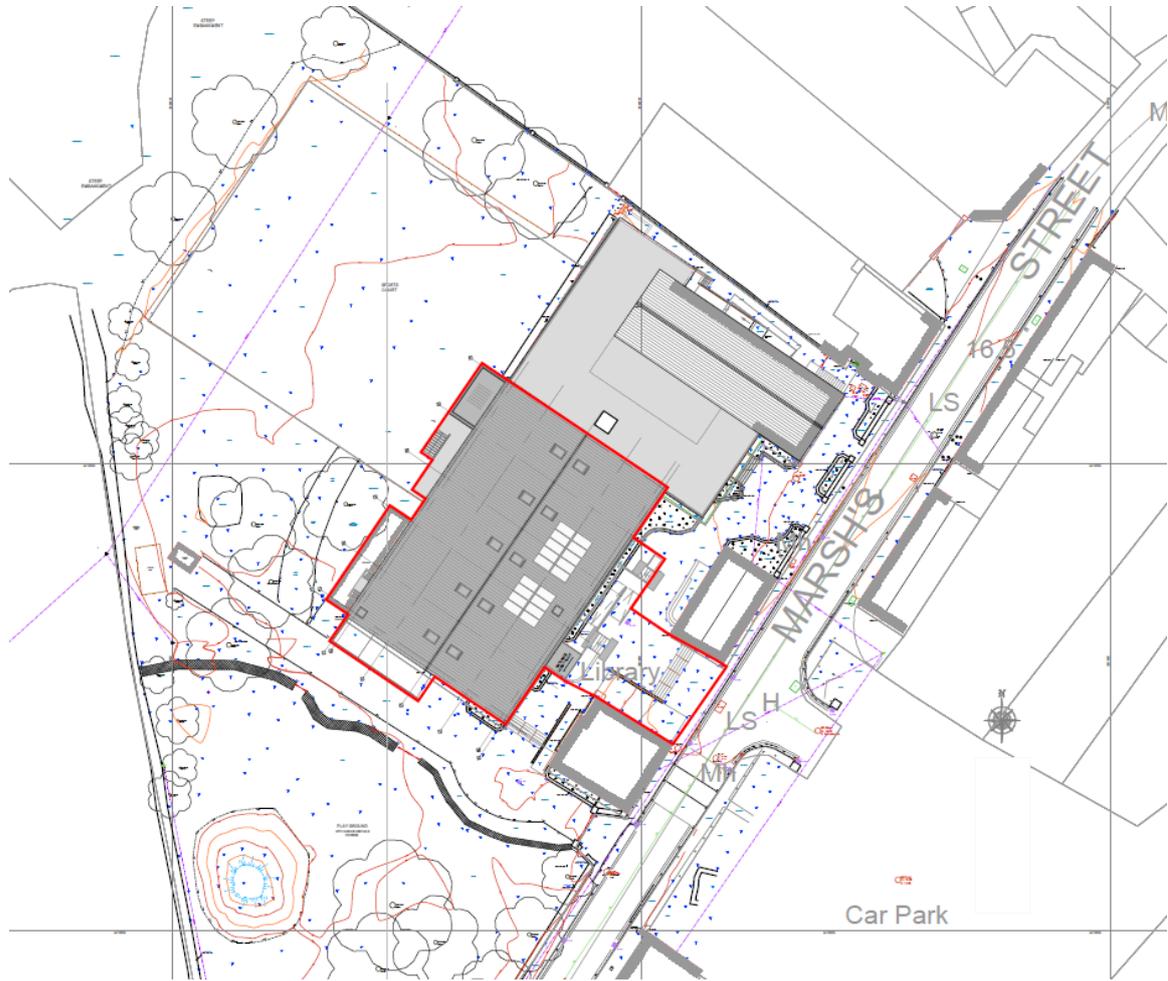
Proposed development site plan (Kenneth Hennessy Architects)
